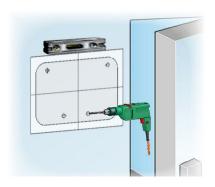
Using the supplied drilling layout, make the four fixing holes on the wall.
